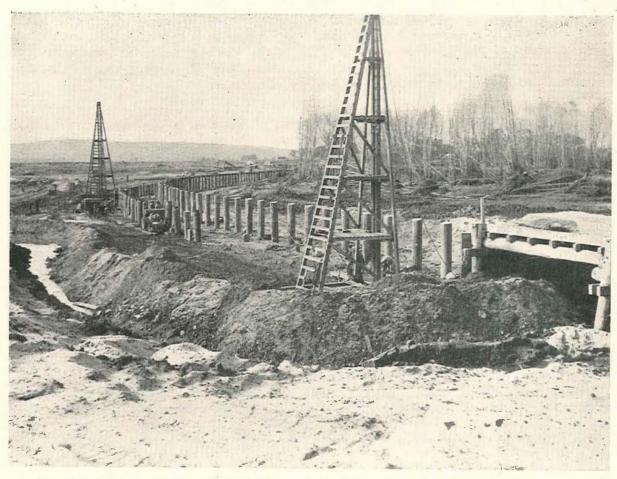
Flood Protection Work in Progress on Marlo Road at Gilbert's Gulch, looking towards Marlo.
